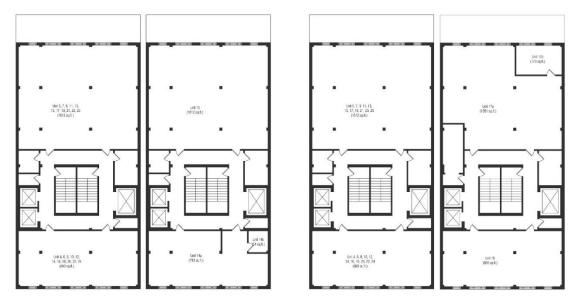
, 565, 566, 567 (left to right): Building 18, seventh floor (1910); same floor (1981); eighth floor (1910); same floor (1981) 1'' = 32'. North is up.
